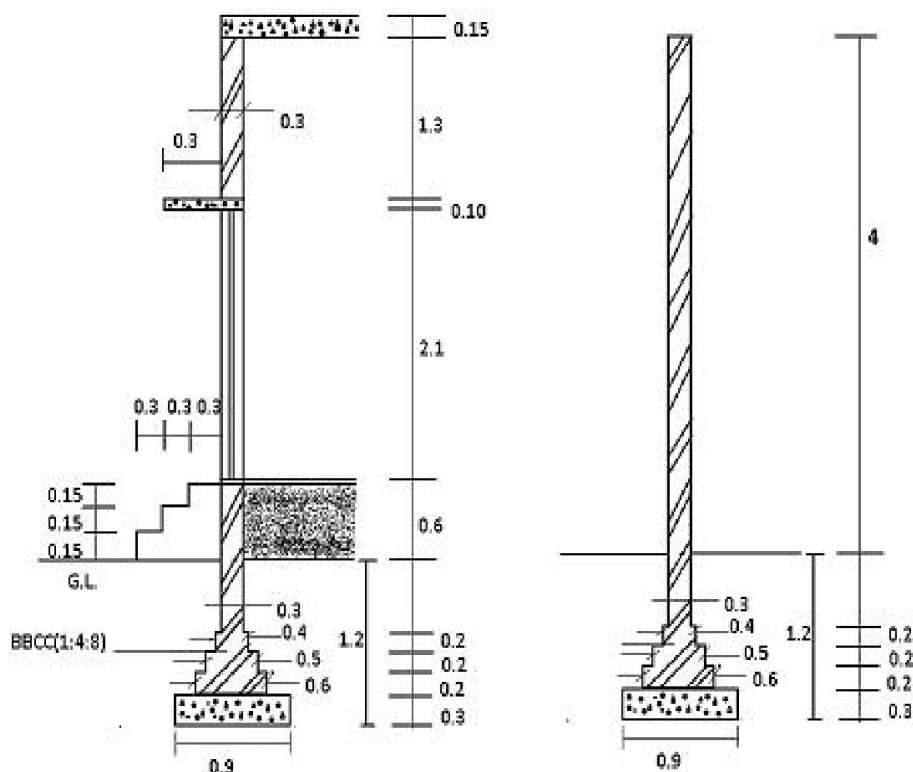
SECTION OF DEFENSE TRAINING CENTRE (BUILDING + COMPOUND WALL)
